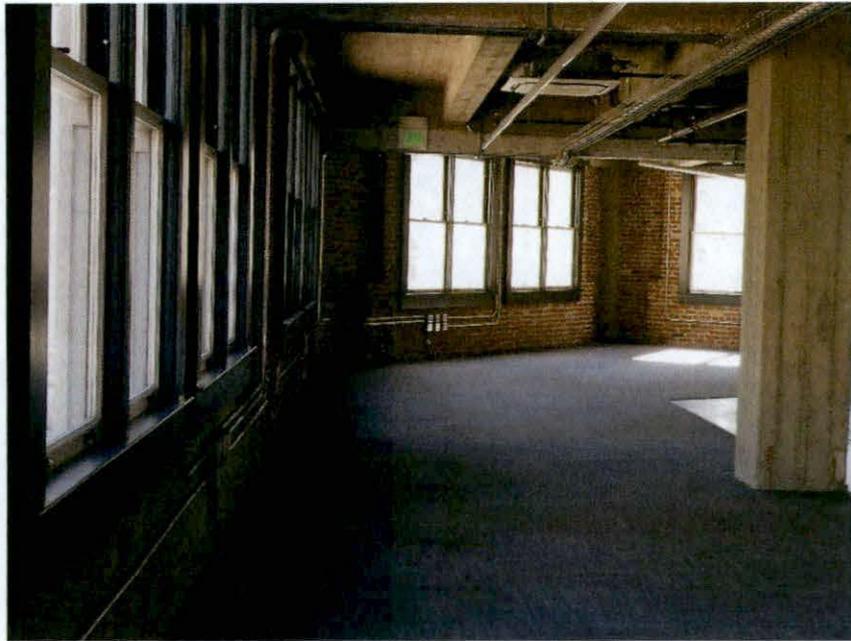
Photo X: View of third level open office space looking southwest. Typical example of building interior in second through ninth levels.
